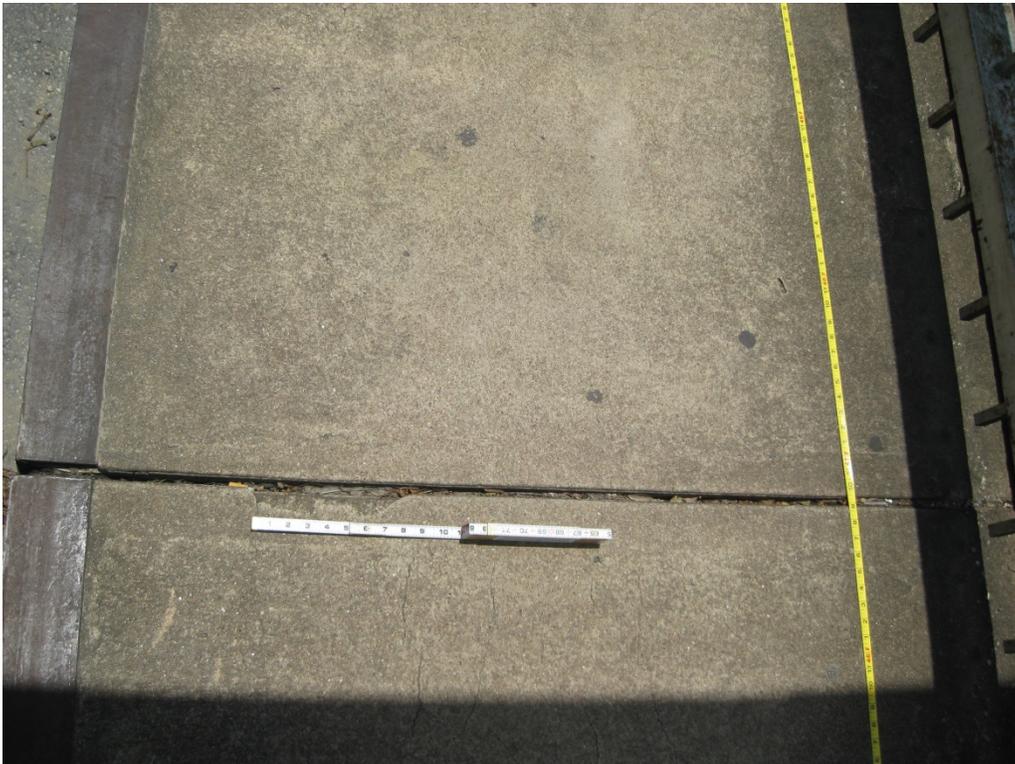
Spall in South Sidewalk overlay 47' east of the West Abutment
